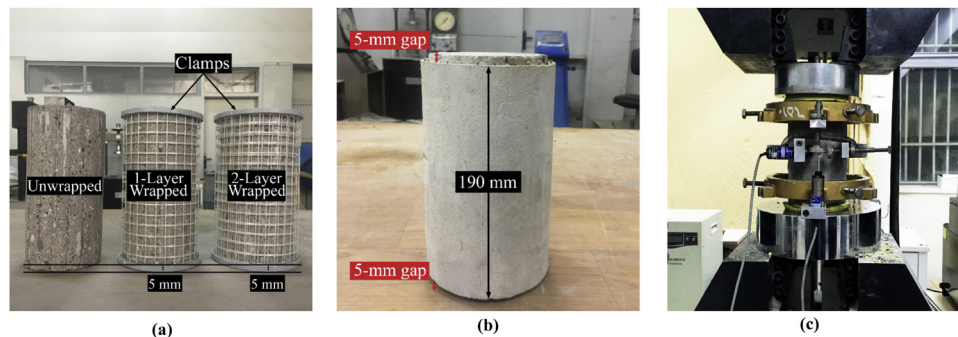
(a) unwrapped and wrapped specimens with AR-Glass textile; (b) confined specimen; (c) compression test setup.
